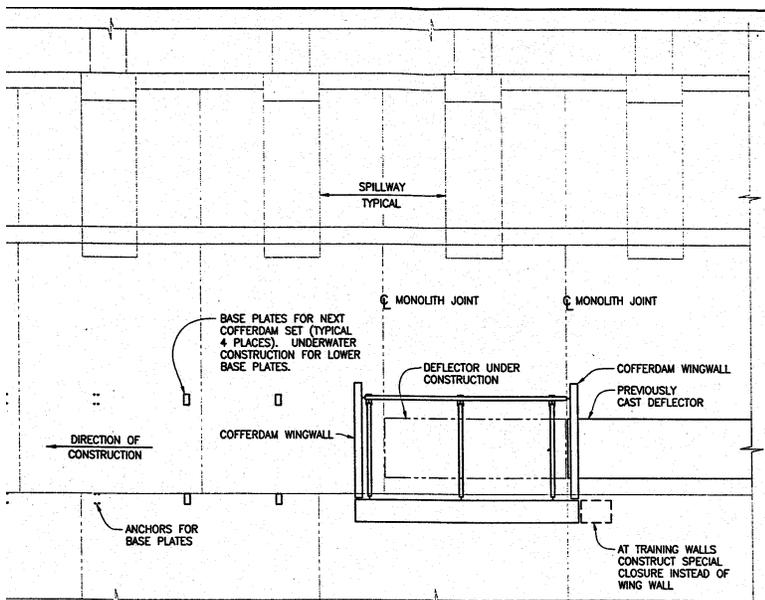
Use of floating cofferdam moving from left side of dam (looking downstream) to right, constructing deflectors in sequence.
